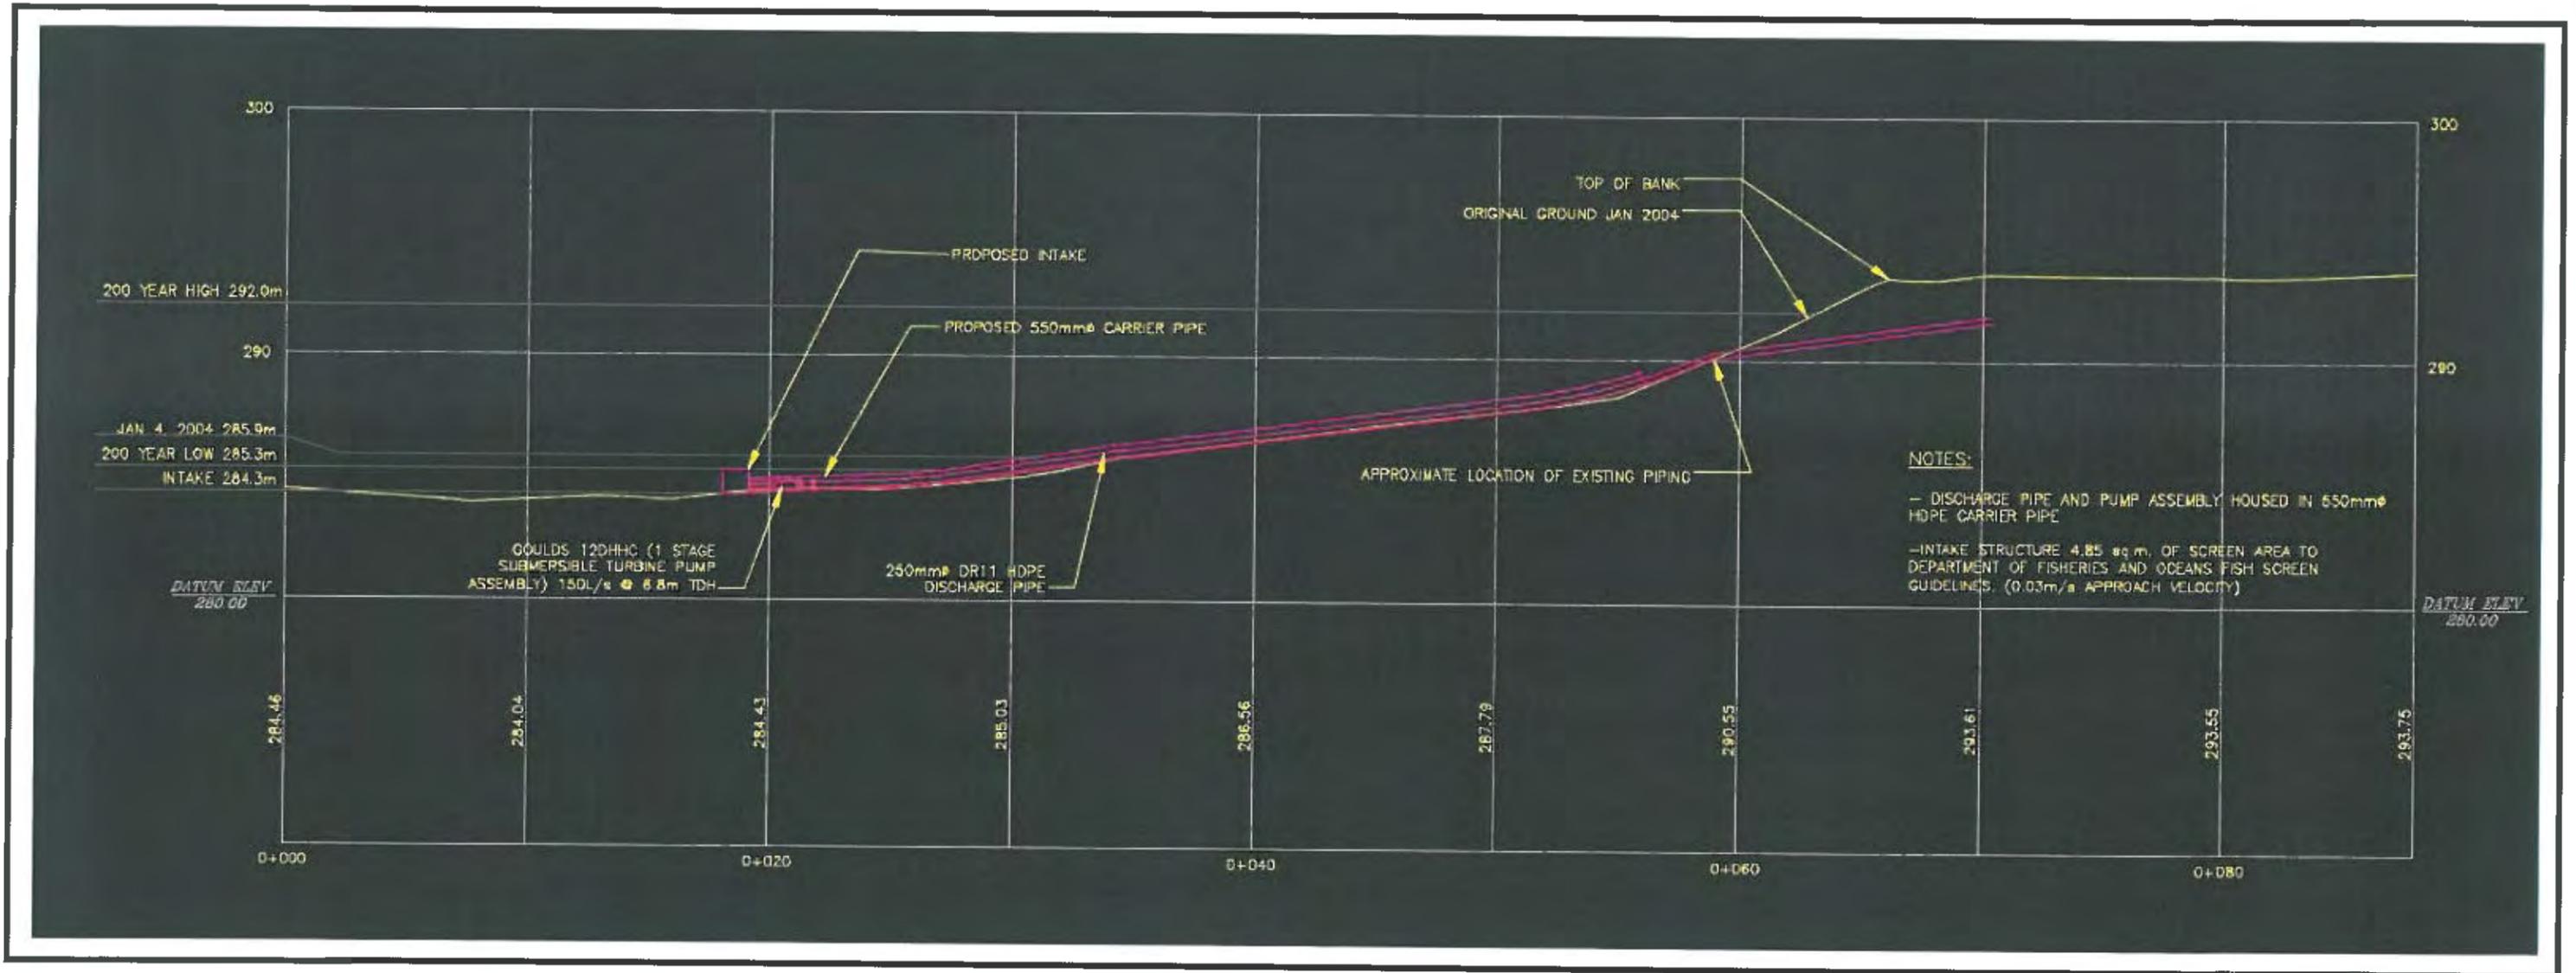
Design cross-section of the intake pipe installed to augment or replace the infiltration gallery (from Urban Systems Ltd.).
